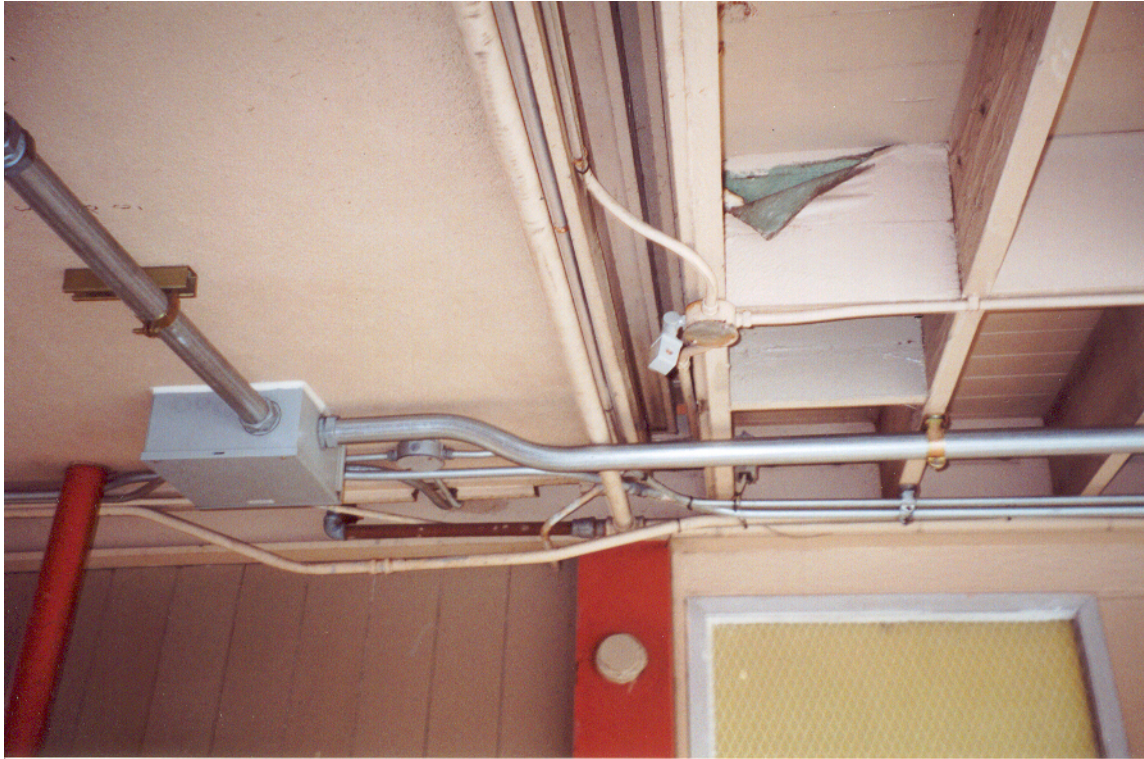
Conduit at Seismic Joint Between Office and Kindergarten Buildings
